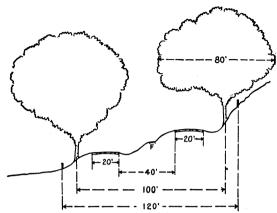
A 120-foot right-of-way with two 20-foot roadways 40 feet apart at different levels and trees 100 feet apart. The footpath (F) is between the roads.
